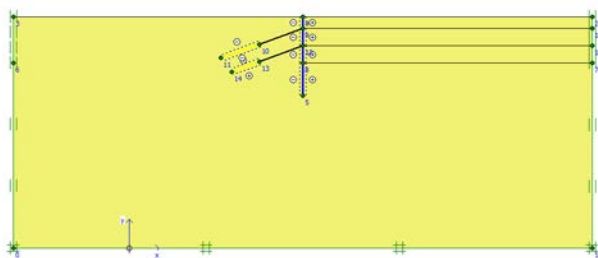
Schematic of Anchored Sheet Pile Wall and Penetration Depths Analyzed for add two anchors
